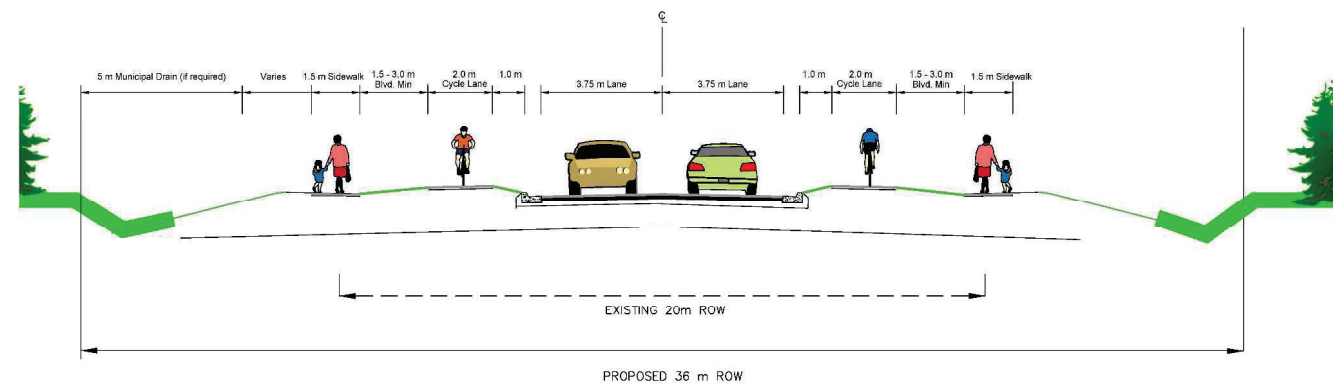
Concession Roads 8 and 9 – Alternative 2 - 2-Lane Urban Cross Section with Cycle Tracks and Sidewalks and/or MUP
